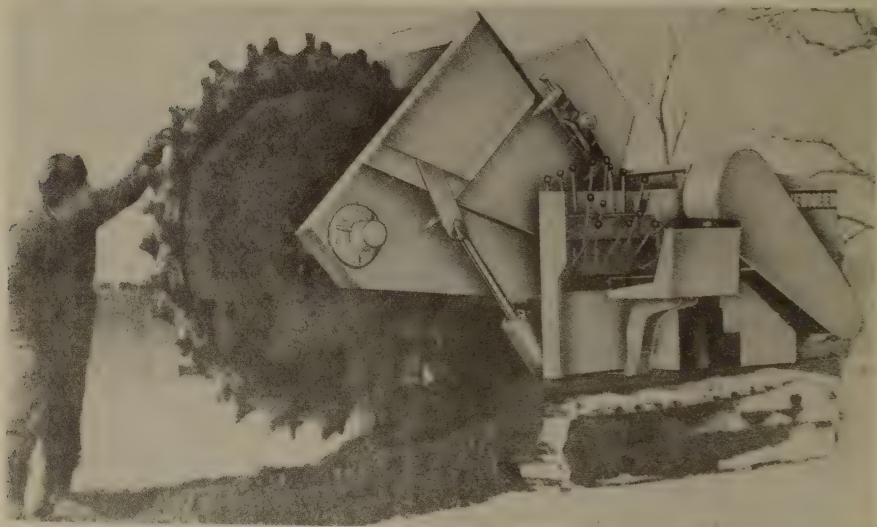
Frost-Cutting Attachment on Trenching Machine. (*Courtesy, Vermeer Mfg. Co.*)
